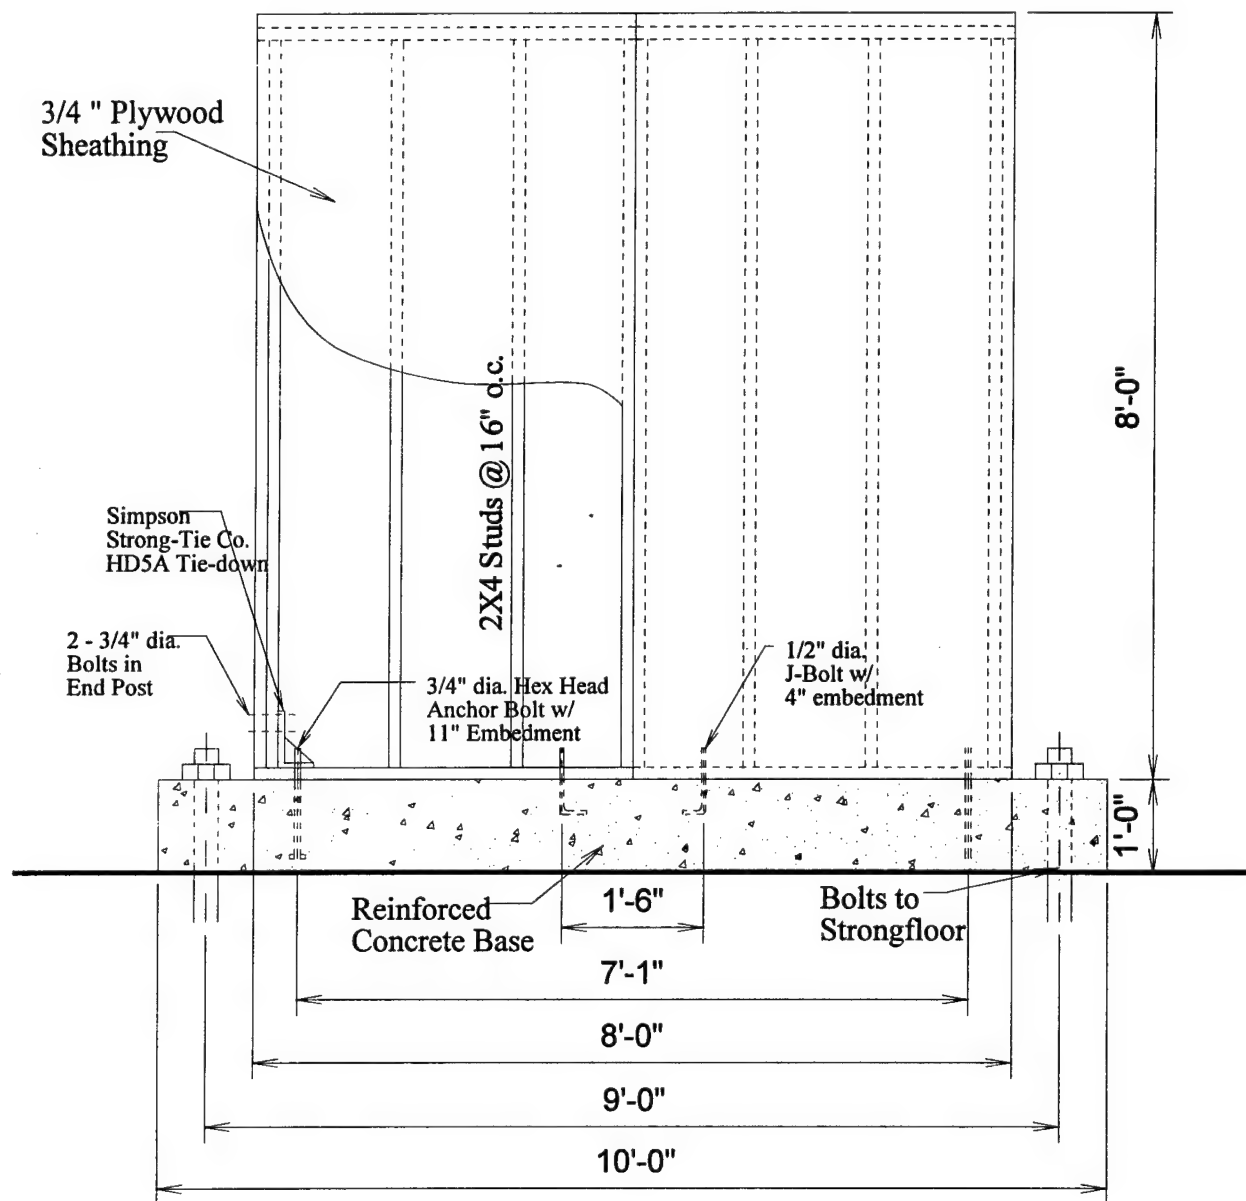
Specimen Construction -- Task 2: Full Scale Plywood Shear Wall Testing
